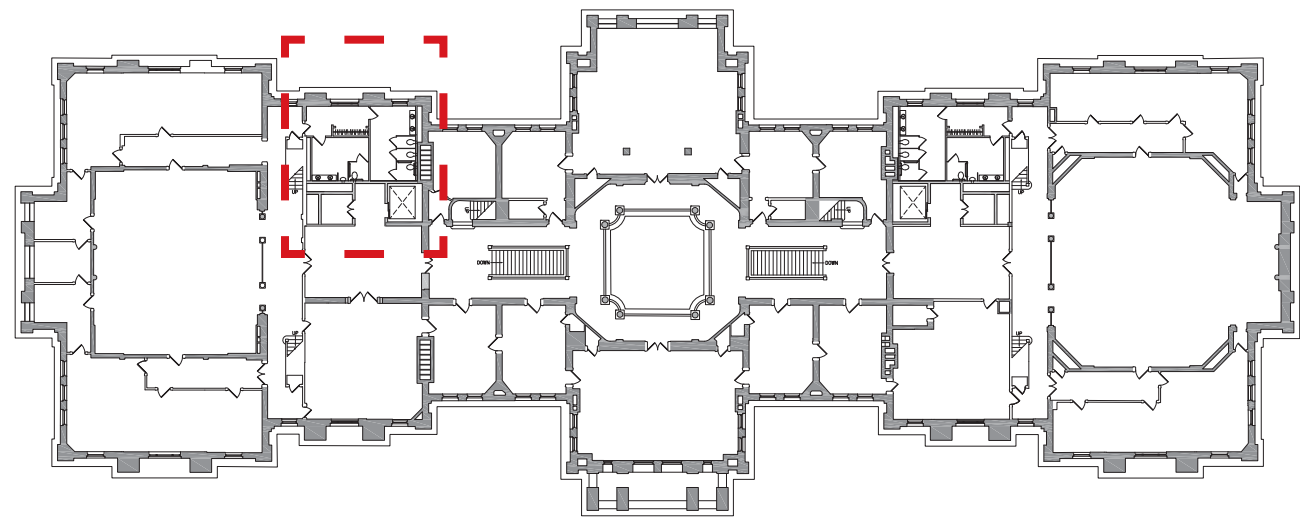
Potential Second Floor Level Plan Layout.
